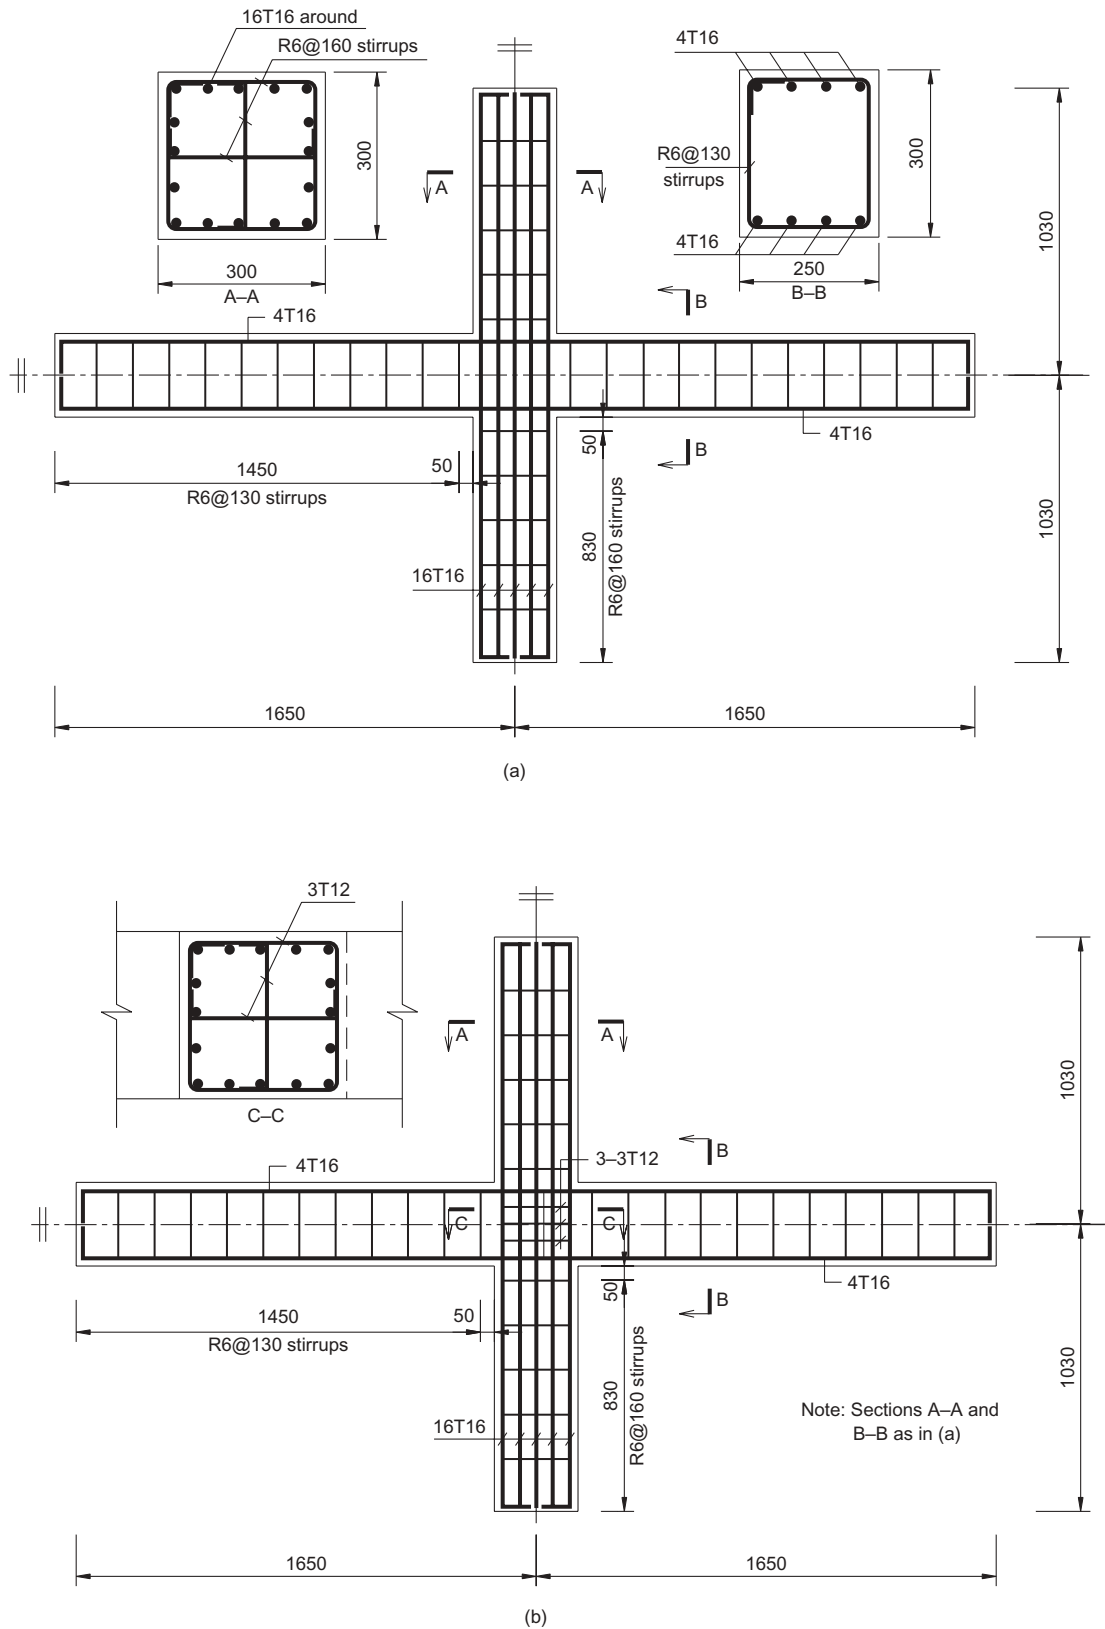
Reinforcement details of beam-column joint specimens: (a) series E; (b) series H (dimensions in mm)
